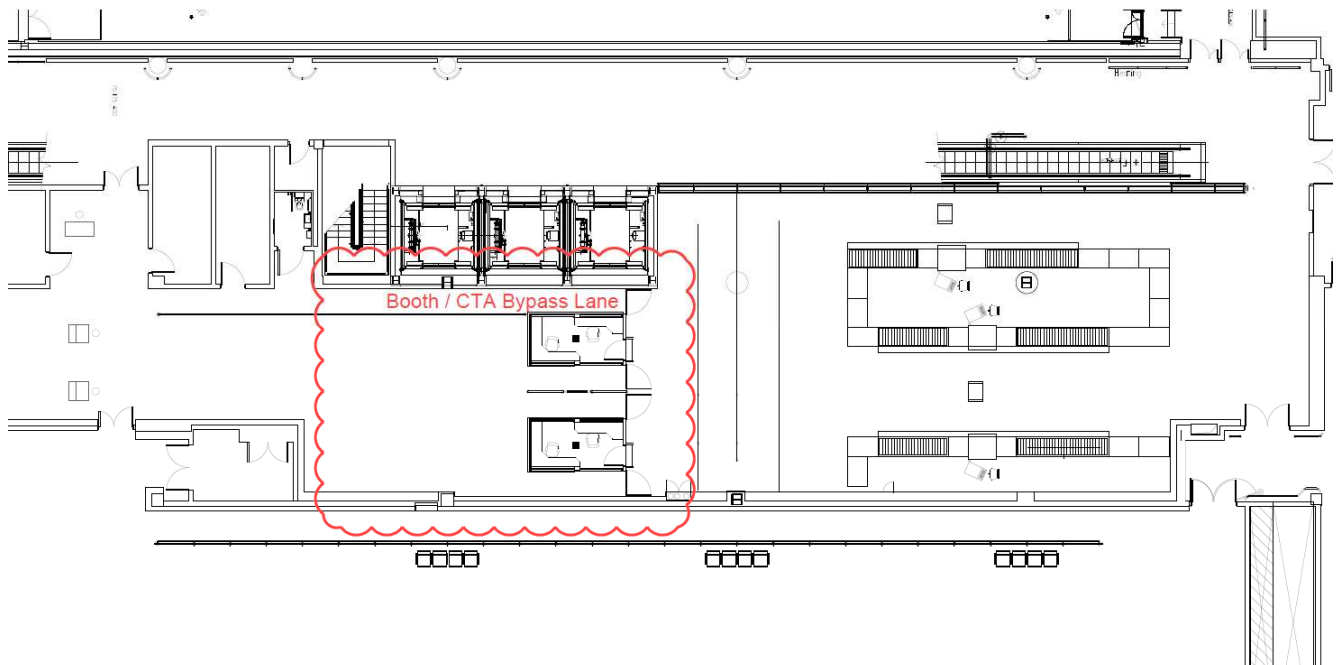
Layout of proposed expansion of Terminal 2 Facility
